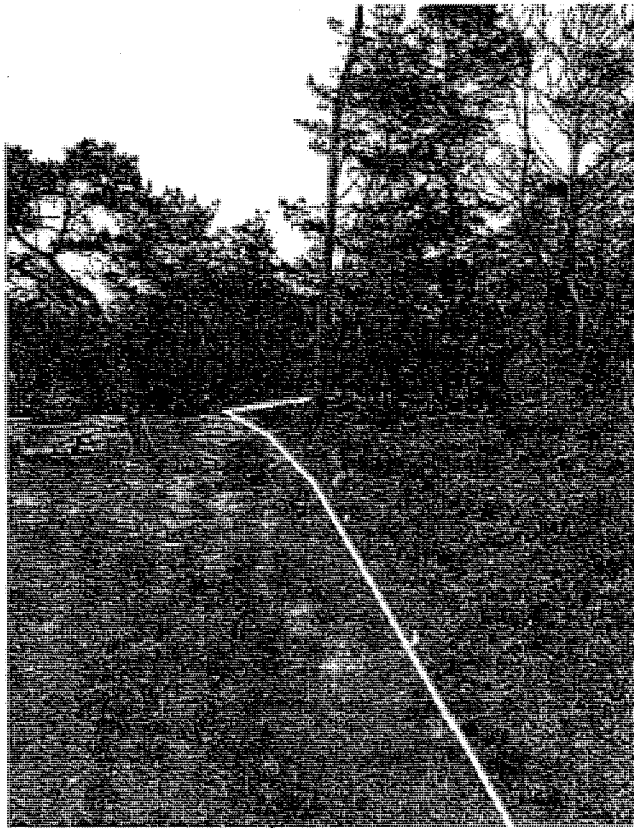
Trail continuation and switchback to bypass existing stairs and provide ADA accessibility.
